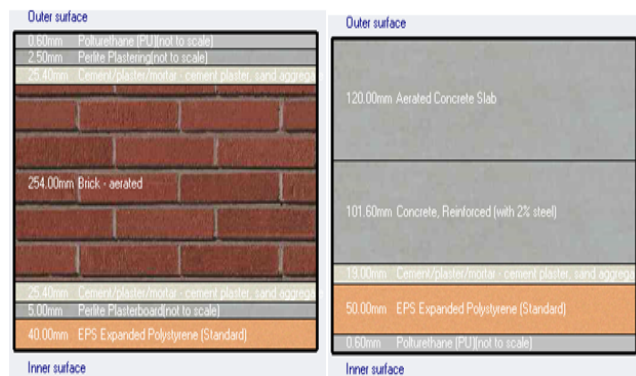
(A) Layers of wall with EEM (B) Layers of roof with EEM
